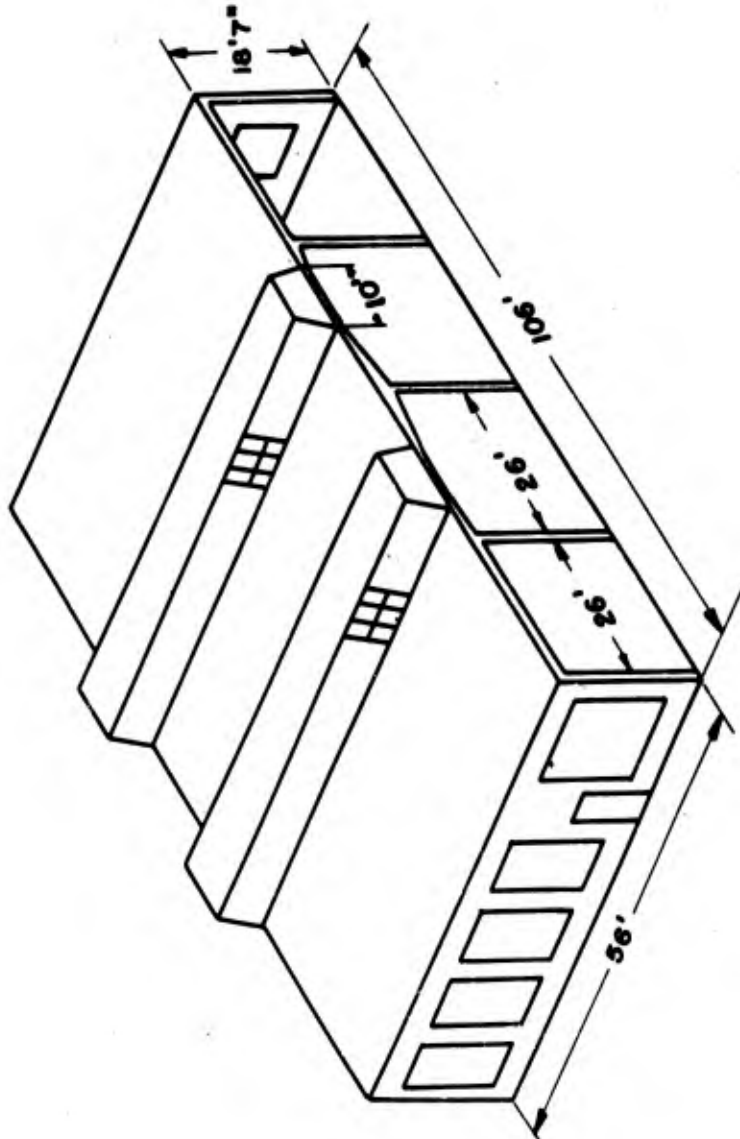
Building 3.3.4 (Wing Walls Omitted)
